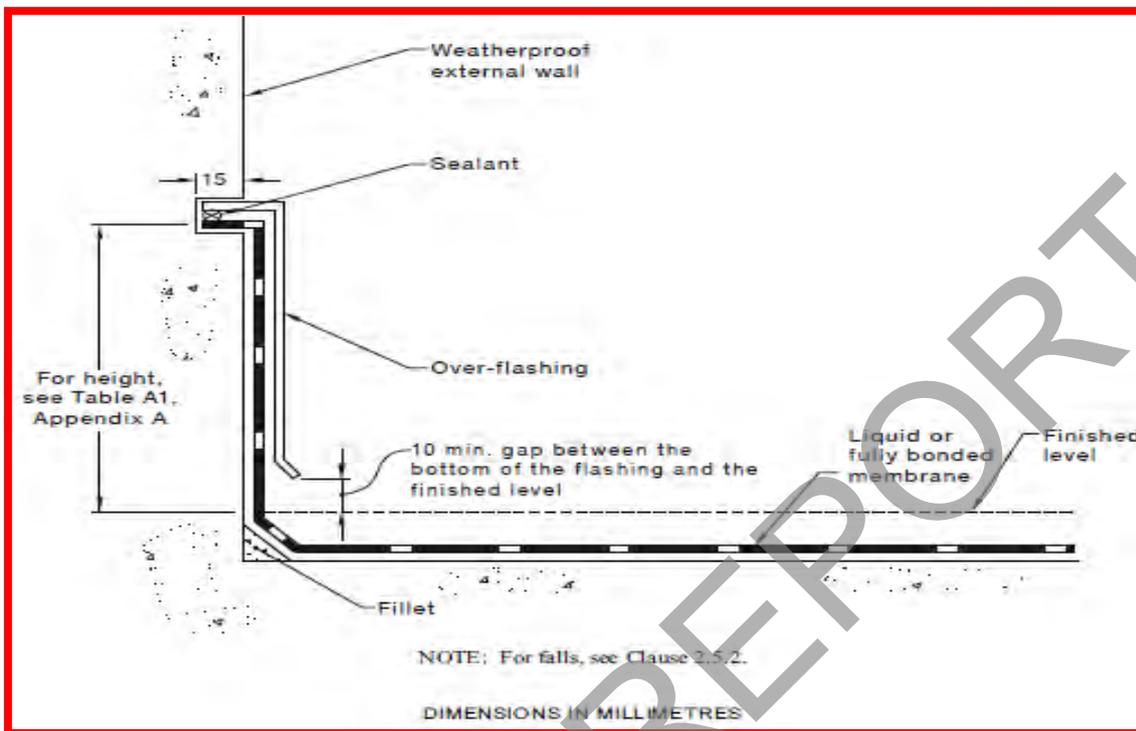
Figure 2.2 Typical Vertical Upward Termination - Detail Of Over-Flashing For Liquid Or Full Bonded Sheet Membranes
